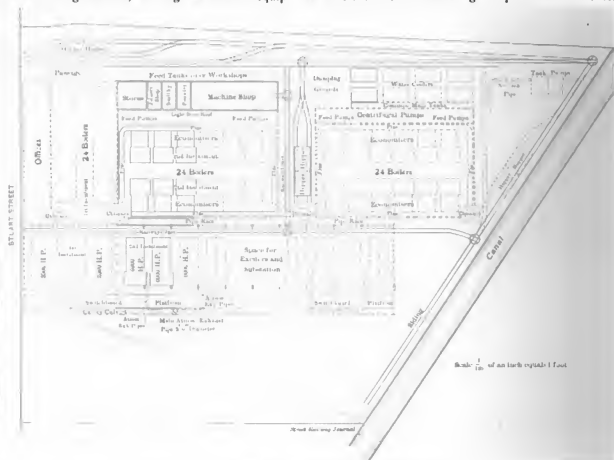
PLAN OF NEW POWER STATION AT MANCHESTER
